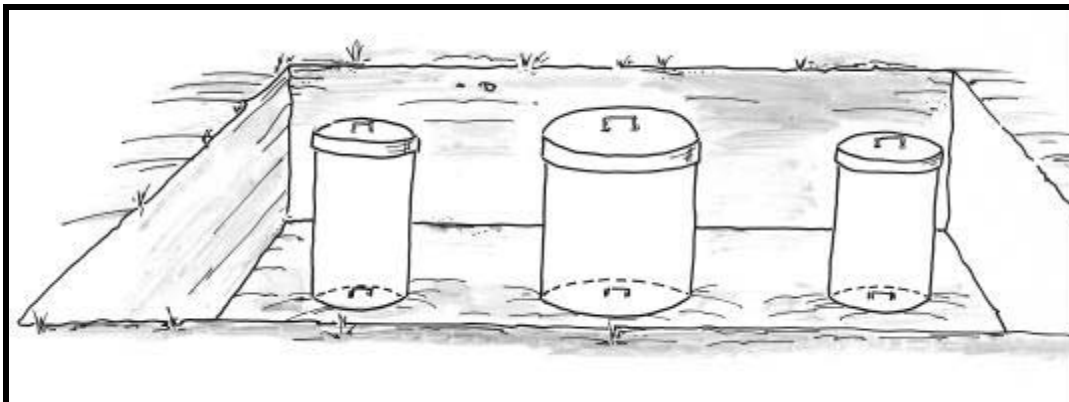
Proper installation of concrete well ring risers on the main access (manhole). Main access (manhole) cover remains on the tank; well rings are capped with a concrete cover that overlaps the outside of the rings to prevent leakage.
